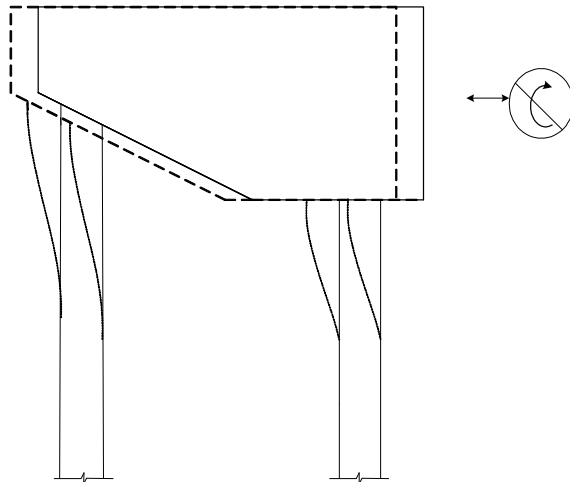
Restrained rotation of an FIAB with pile supported U-wingwalls
